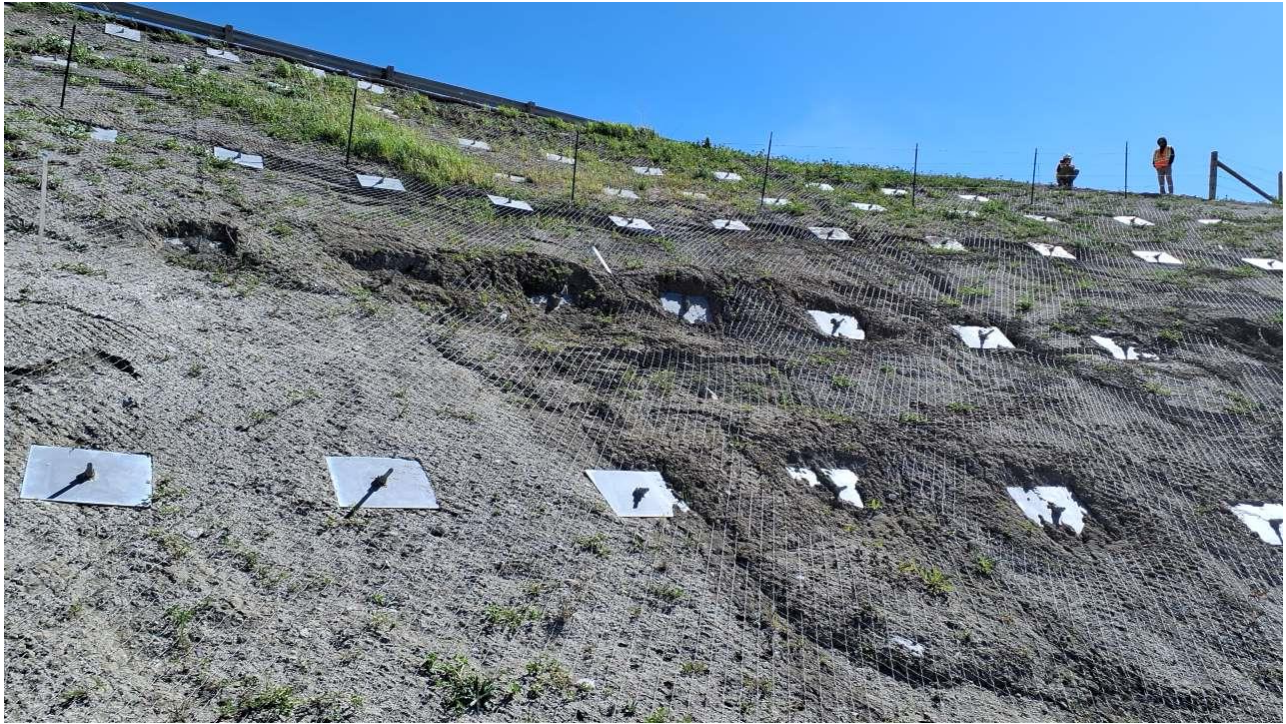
Slope movement on west flank of repair slope. Photo taken facing northeast on May 29, 2024.
